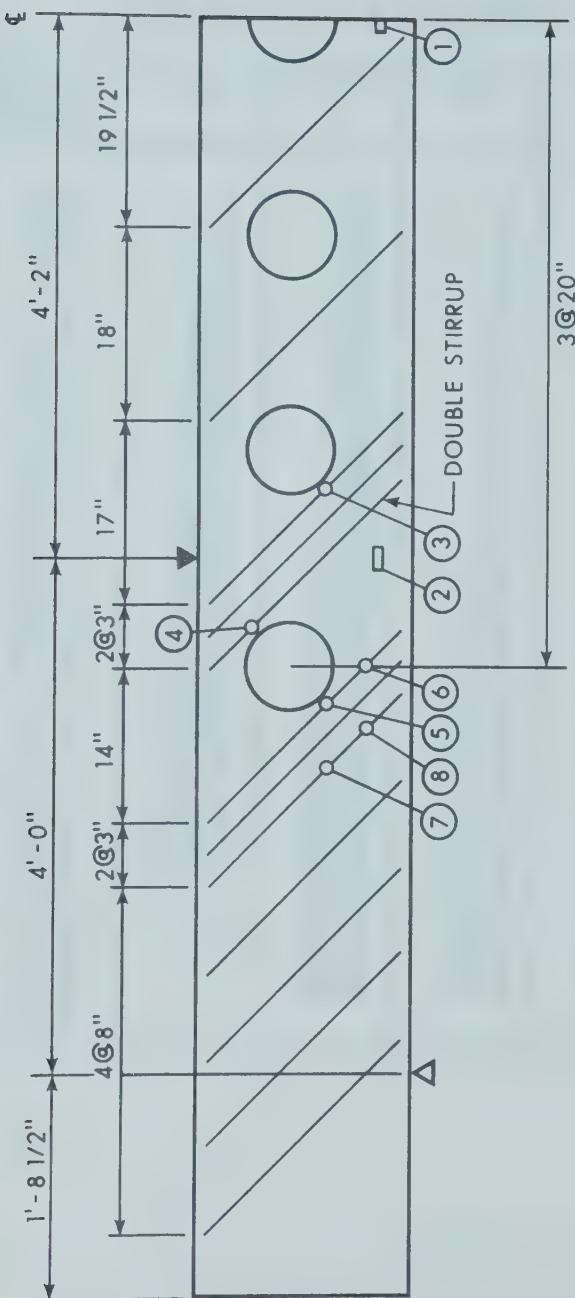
BEAM AD-7 REINFORCEMENT AND GAUGE DETAILS
